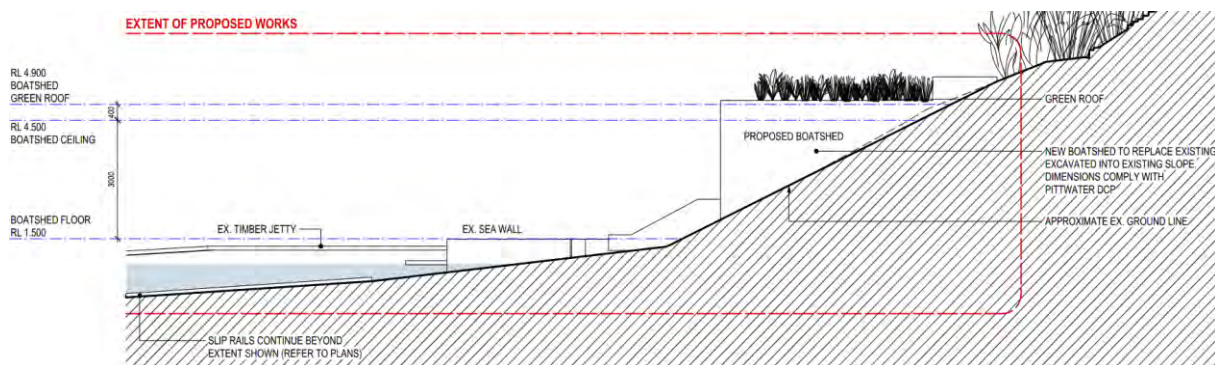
South-West Elevation of Proposed Development (extract from drawings by MHDP Architects (2021, provided in Appendix B))
